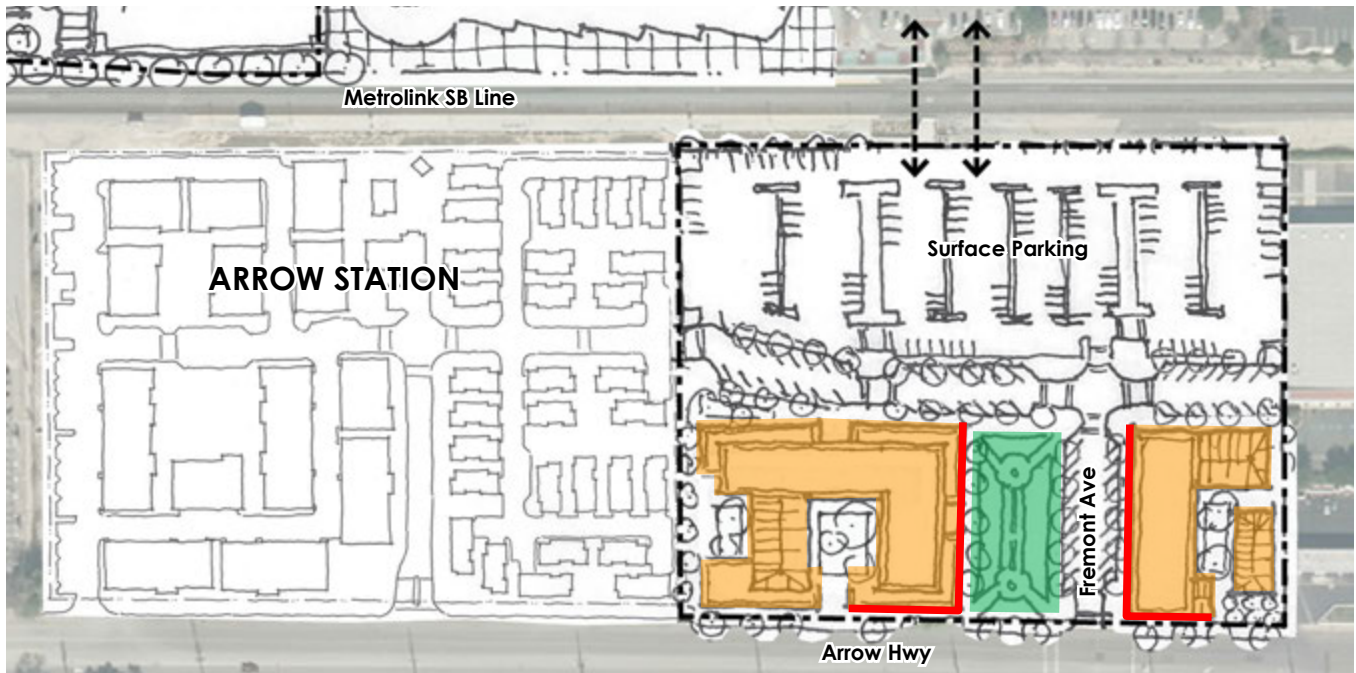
ALTERNATIVE B-2 ILLUSTRATIVE SITE PLAN CONCEPT PHASE 1 SOUTH OF THE METROLINK TRACKS
